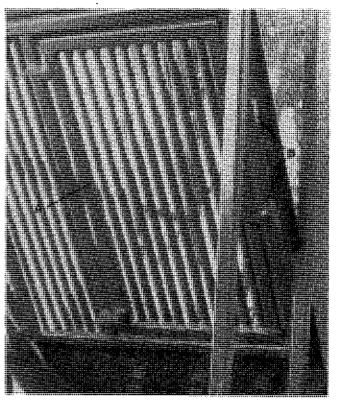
ACCESS DOOR IN HOLDING TANK
